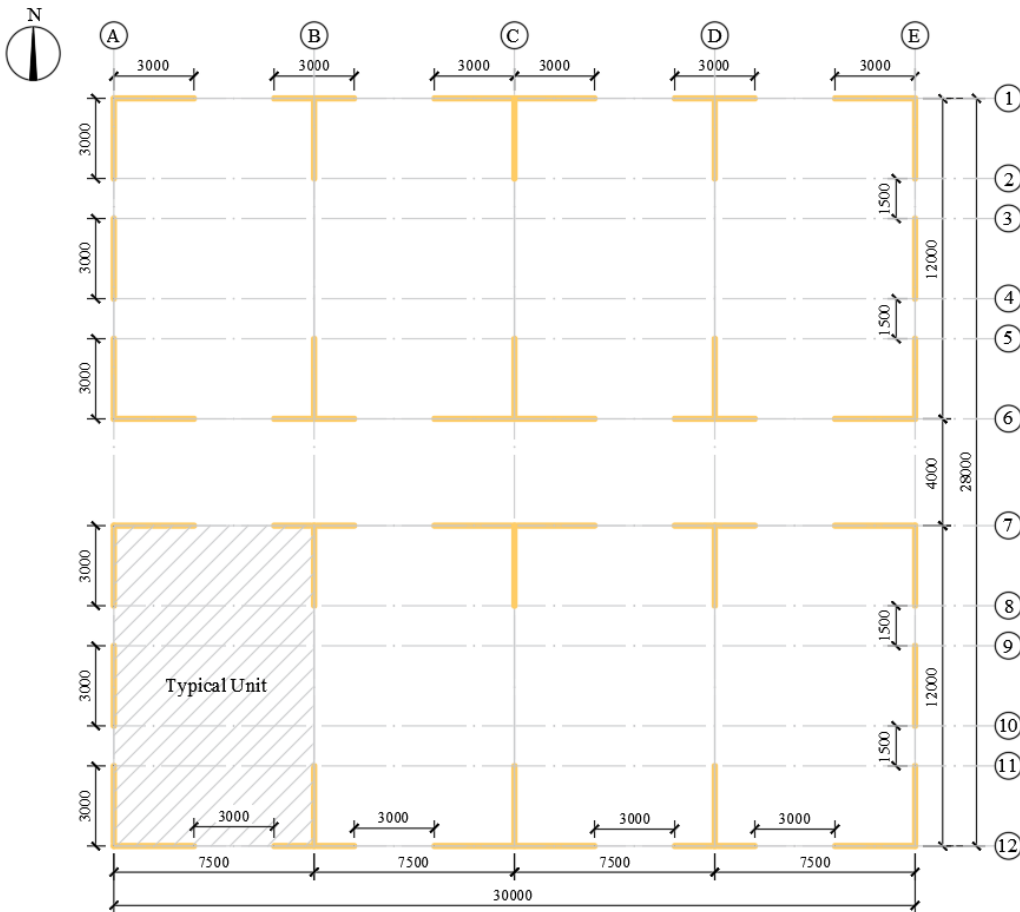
Configuration of the prototype CLT shear wall structures: plan view
